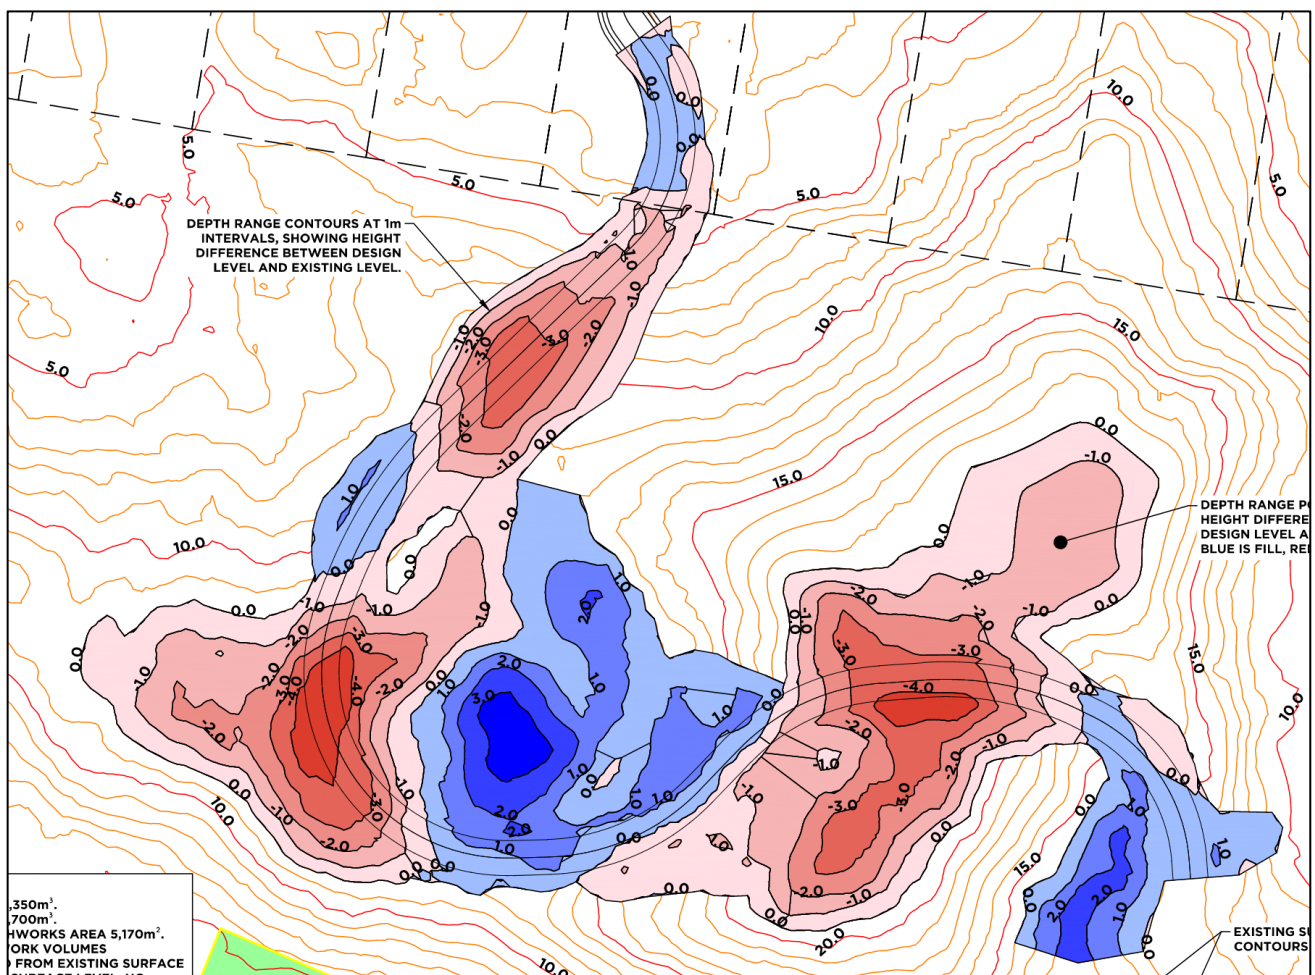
Plan of proposed earthworks showing cut in red and fill in blue
